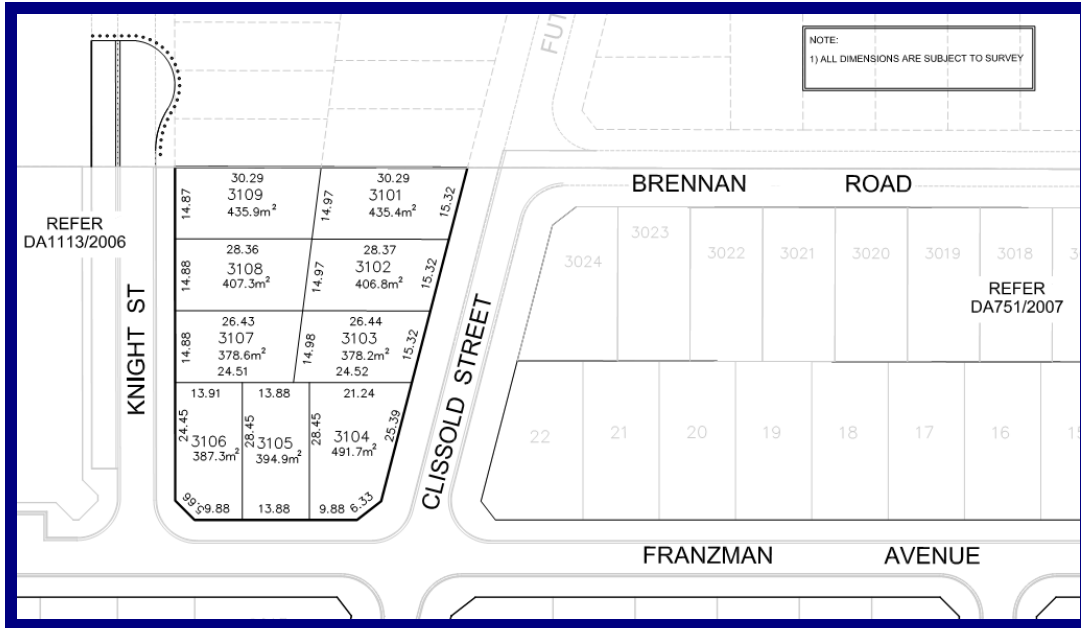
PLAN OF PROPOSED SUBDIVISION
